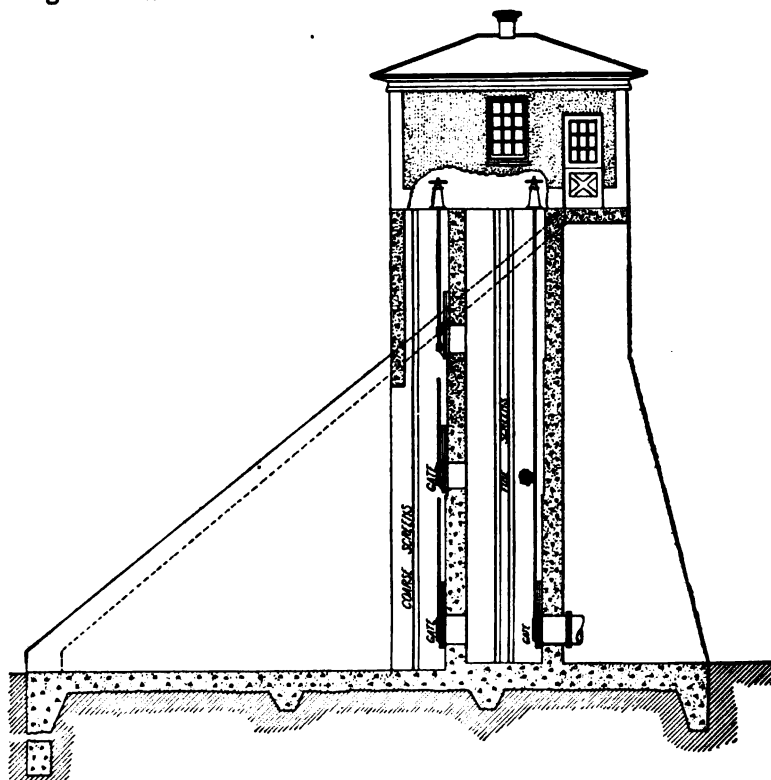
SECTION OF PITTSFIELD DAM, SHOWING GATE-HOUSE CONTAINED.
